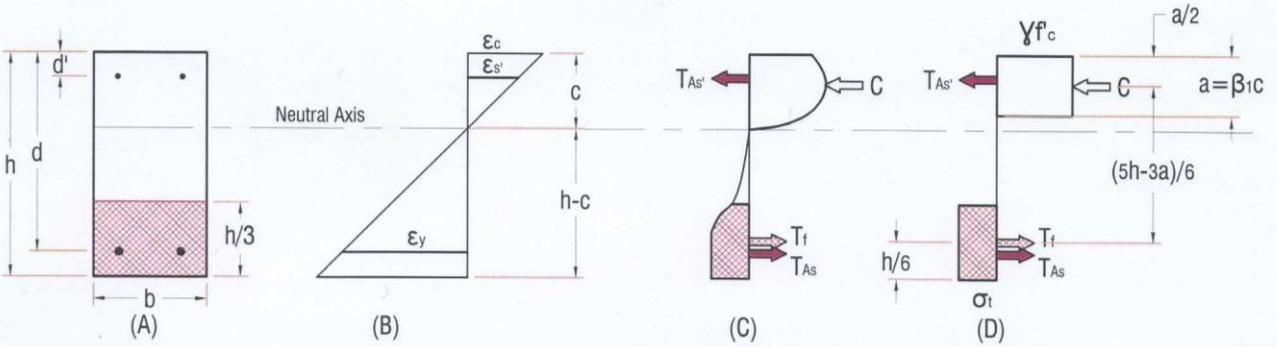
Strain and stress distribution for cross section of the doubly reinforced plain concrete beam (ACI 318M-08)
